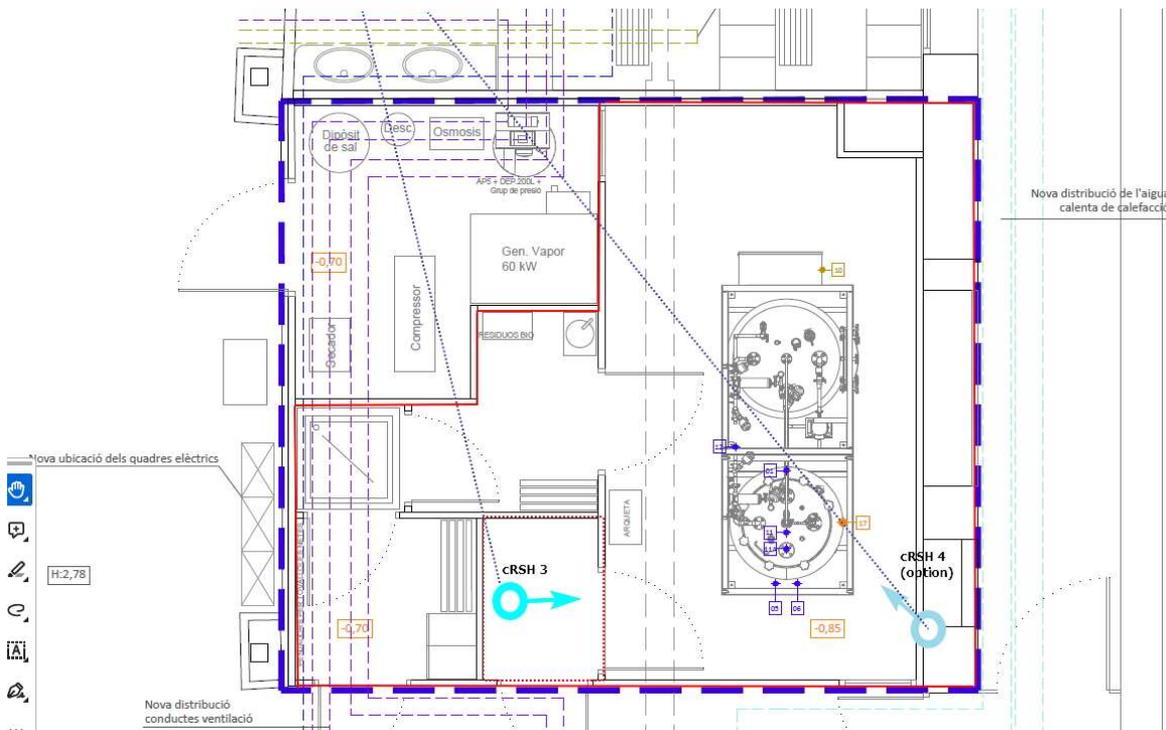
Complete layout of the areas to be decontaminated (1st floor).
